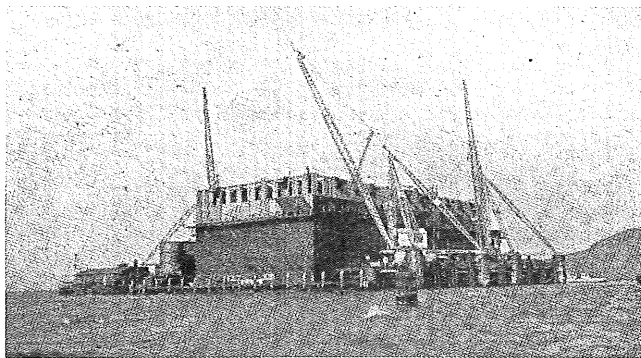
CAISSON BEING SUNK FOR A PIER OF SAN FRANCISCO-OAKLAND BAY BRIDGE.
